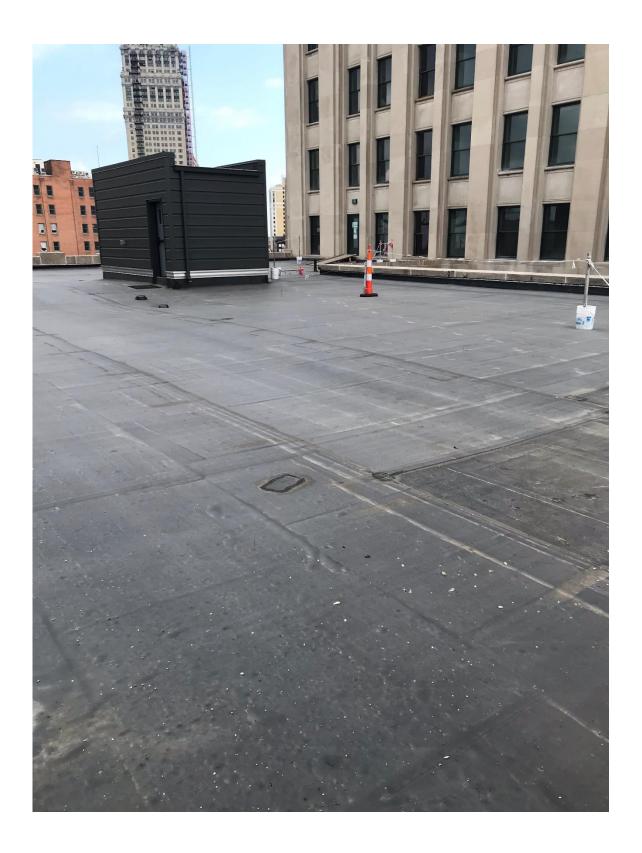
Exterior, West Roof, Looking Northeast. 7/31/19
